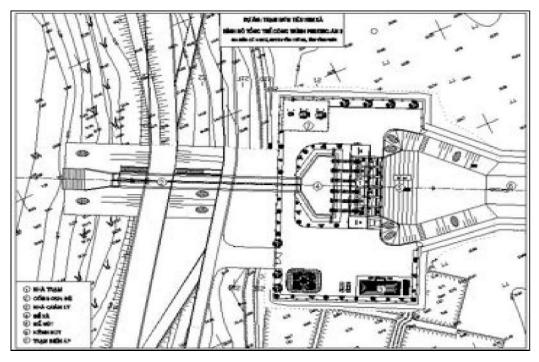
Typical pumping arrangement site for Ngu Kien pumping station
